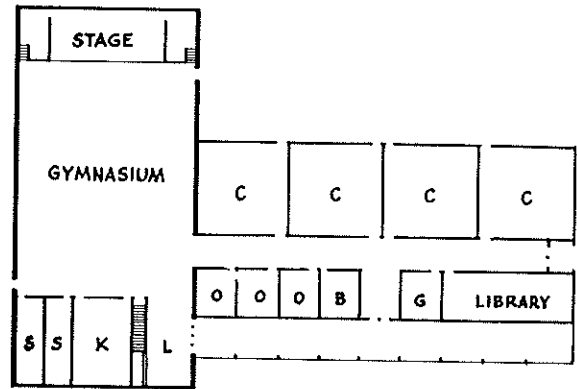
Floor plan of a school. 128'-0" \times 188'-0". The gymnasium truss is 8'-0" deep and clears the floor by 24'-0". Roof structure over classrooms is 2'-0" deep. Ceiling height in all rooms but gymnasium is minimum of 10'-0".
